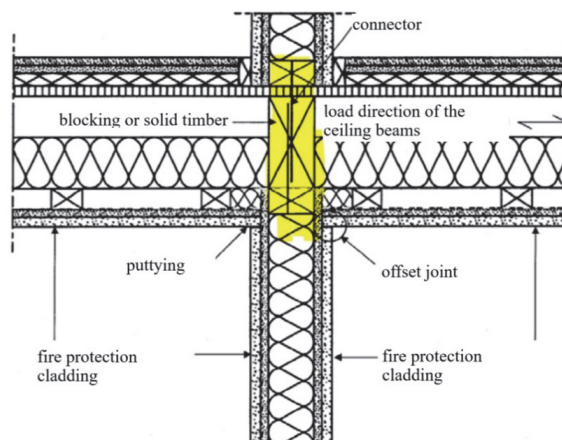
Connection of load-bearing and room-enclosing wall to ceiling, with the ceiling joists oriented perpendicular to the wall (vertical section)
